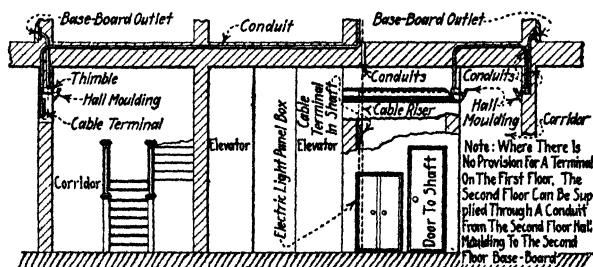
Section through an office-building showing telephone wiring in conduit.
